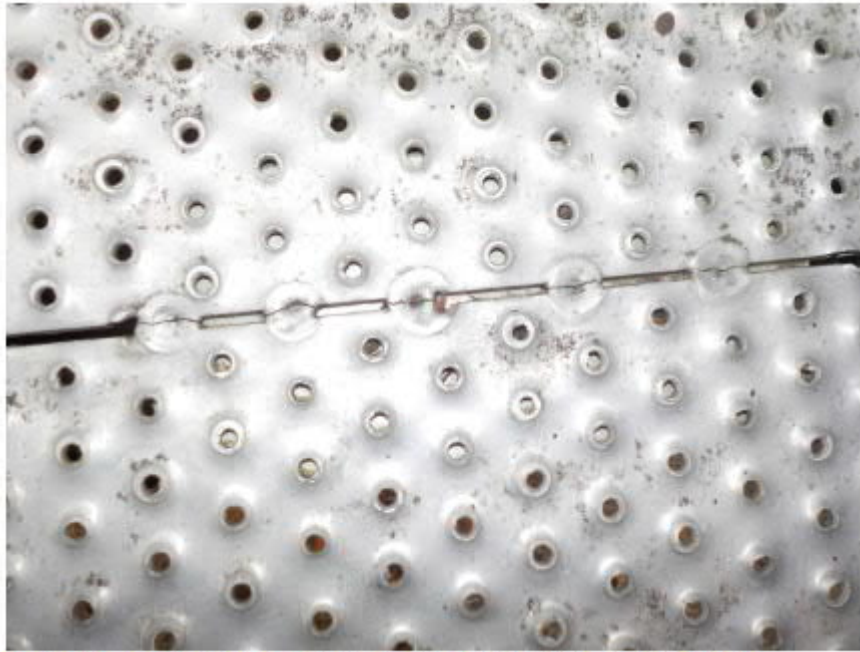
Puddle welds at C-channel member connections are cracked
